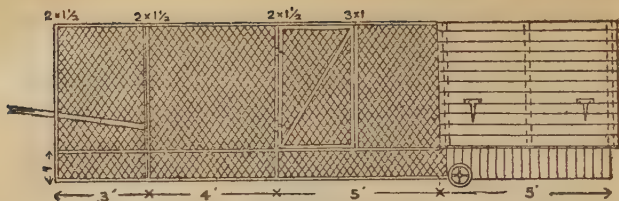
DIMENSIONS FOR POULTRY HOUSE
